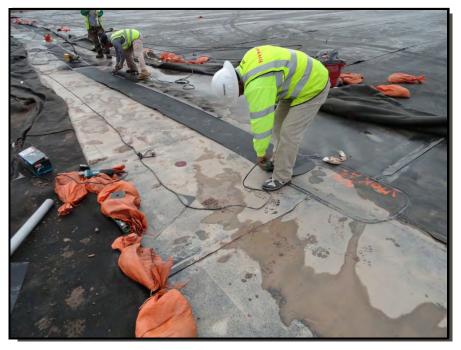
Calibrated tensiometers were used to conduct field testing of trial welds and destructive samples.
